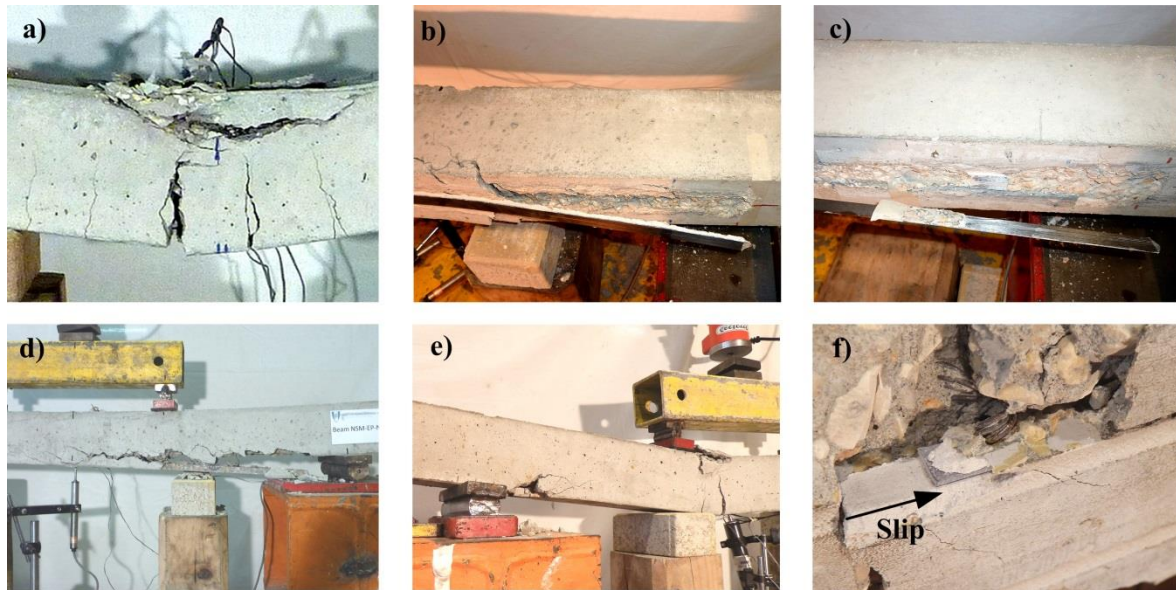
Failure modes of tested beams: a) RC - concrete crushing; b) EBR-F and c) EBR-C – debonding of the CFRP strip; d) NSM-F – concrete peeling-off; e) NSM-C – concrete crushing at the midspan section after slip at the CFRP-adhesive interface; f) NSM-C – detailed view of the slip between the CFRP and the adhesive.
